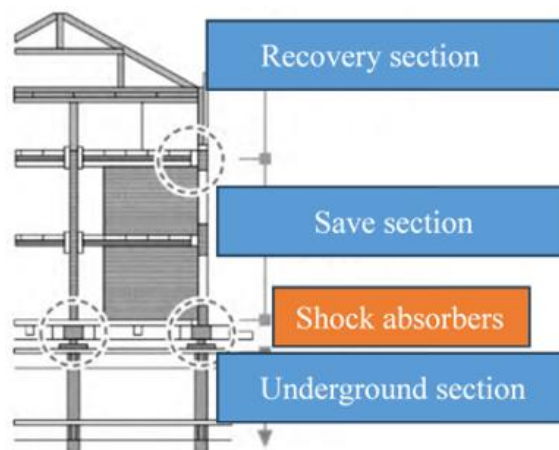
Vertical structure profile of Tokyo Railway Station after renovation [3].
